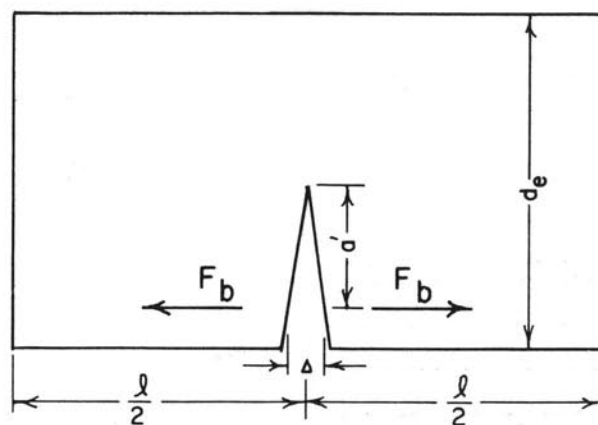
CRACKED CONCRETE ELEMENT FROM TENSION MEMBER
